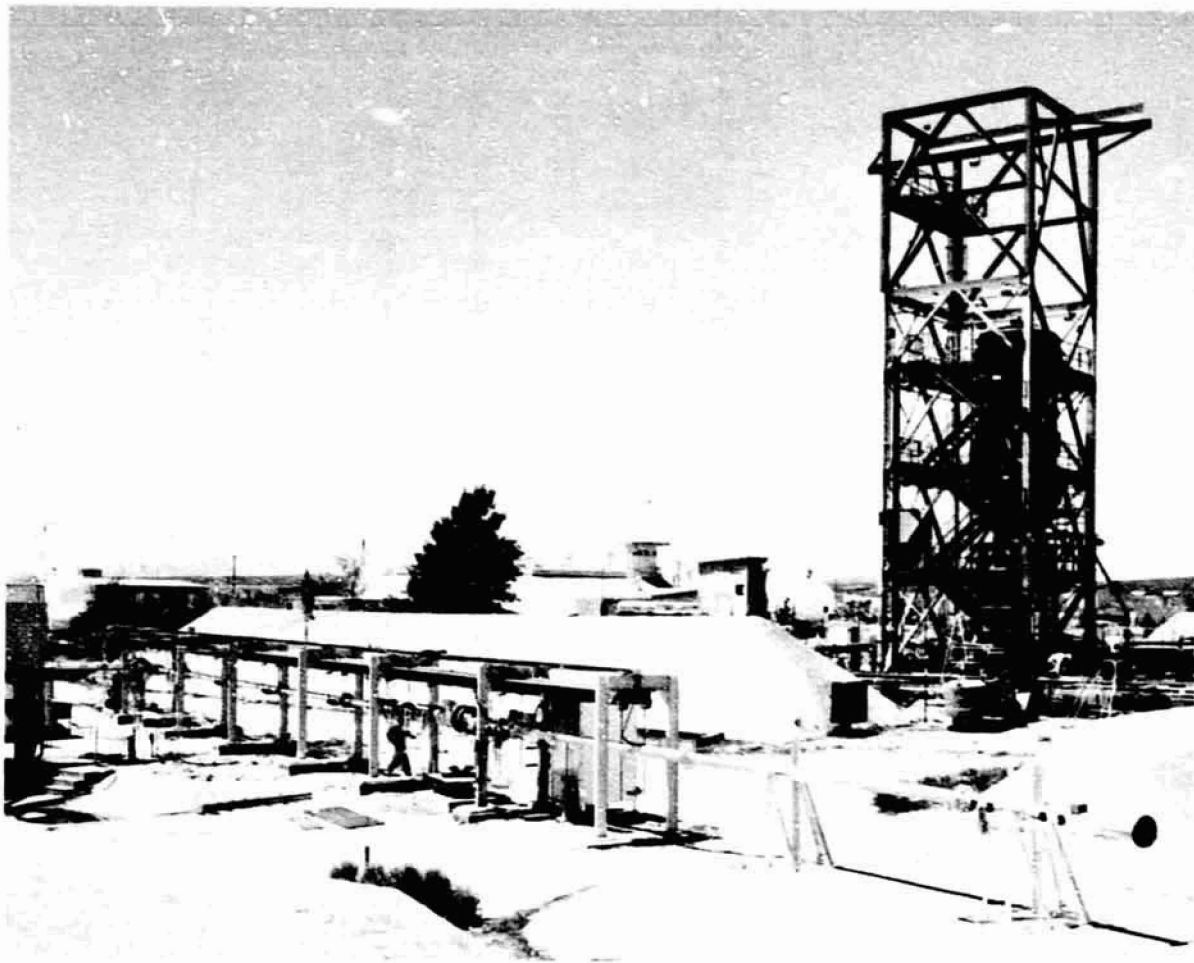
Facility Piping Assembly with the 13.4-m-Long Extension Sections Installed
